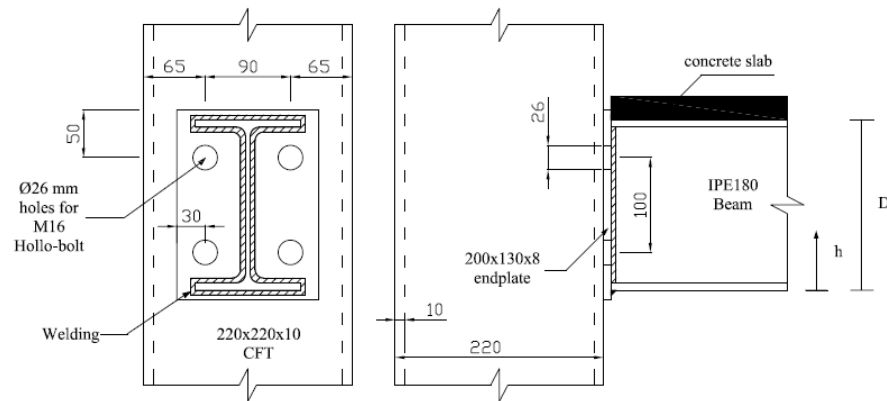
Geometrical definition of an I-beam to 220x220x10 mm hollow section column connection
